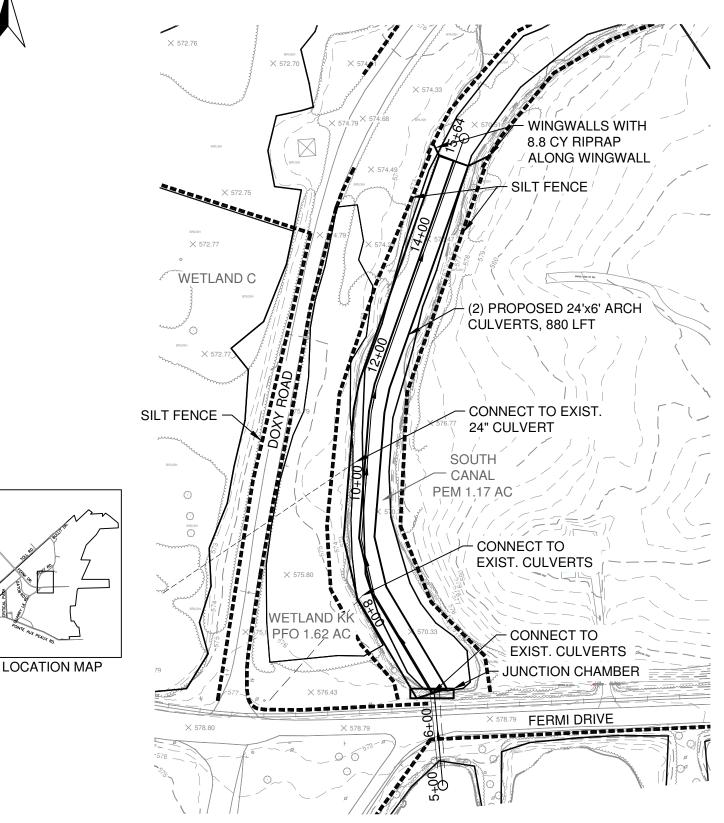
A CONSTRUCTION AREA 5 PLAN VIEW
